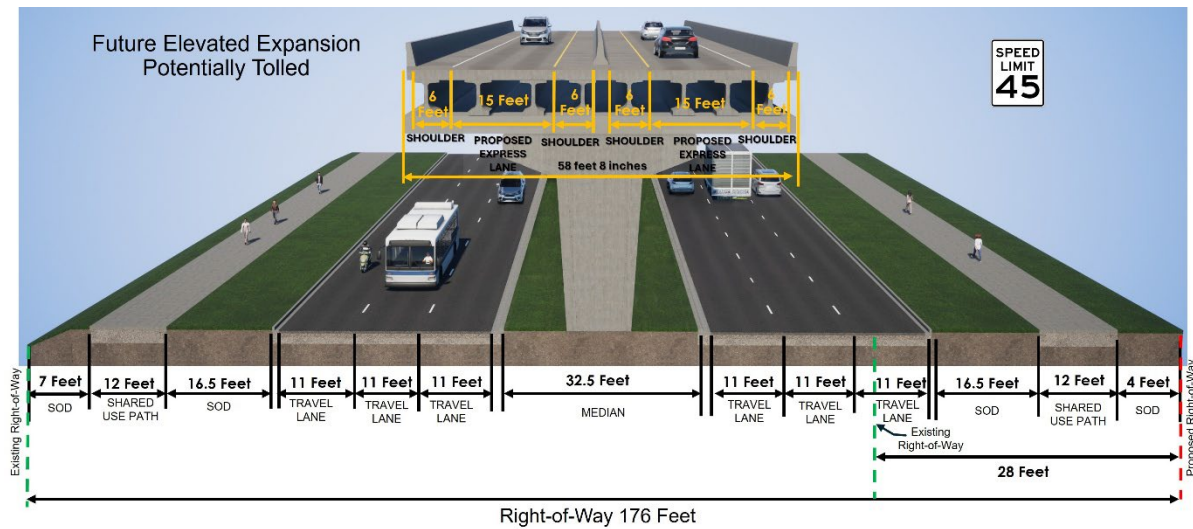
Preferred Roadway Typical Section: North of DeSoto Bridge
